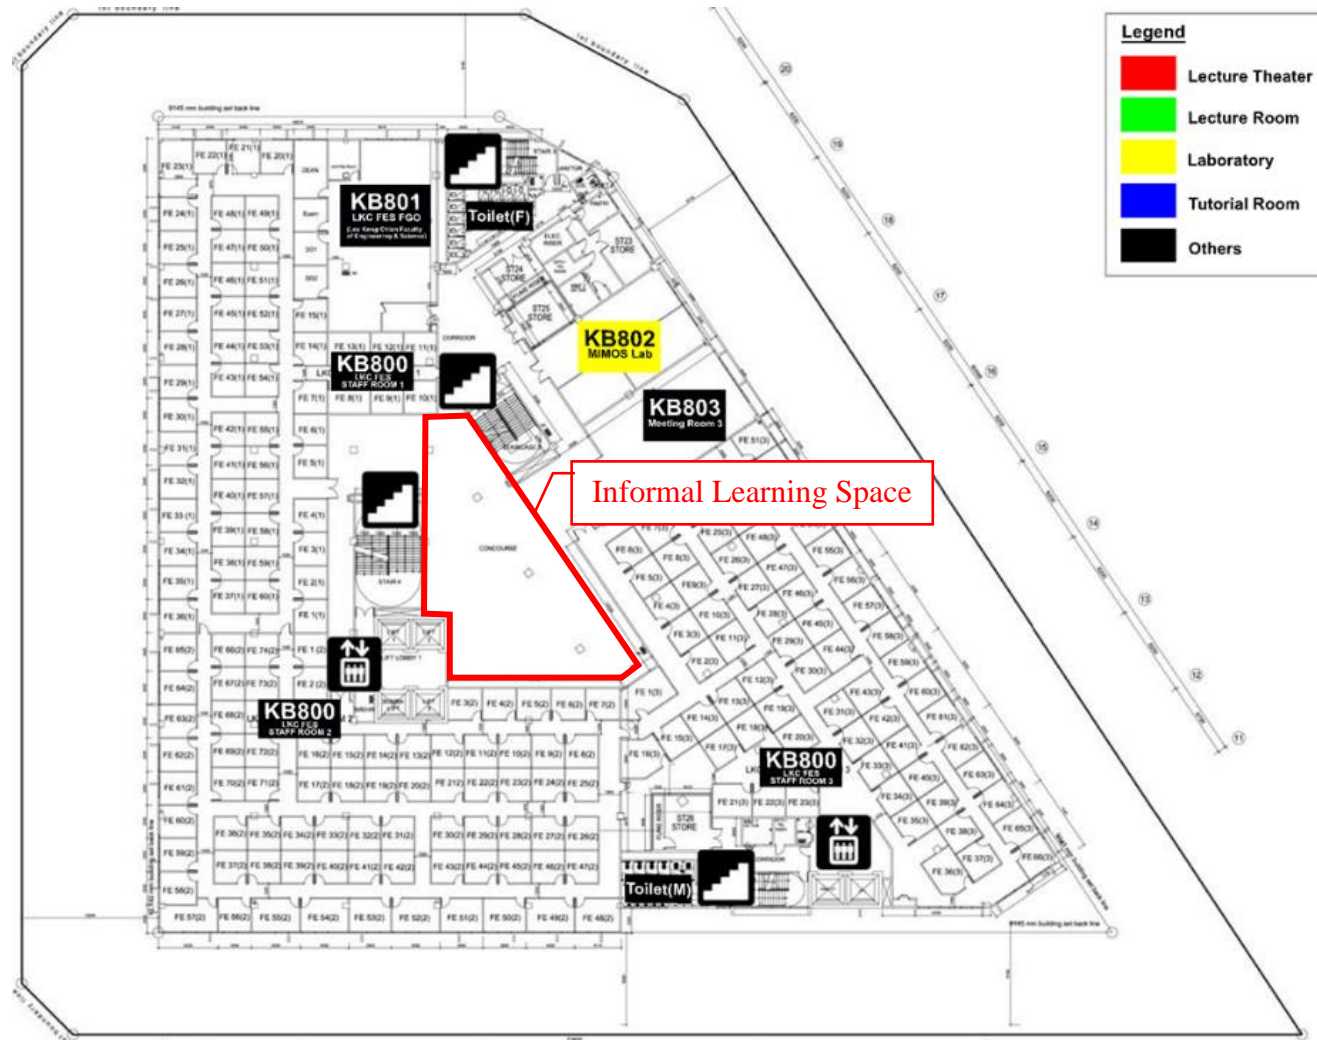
Sungai Long KB building floor plan – 8th floor.
